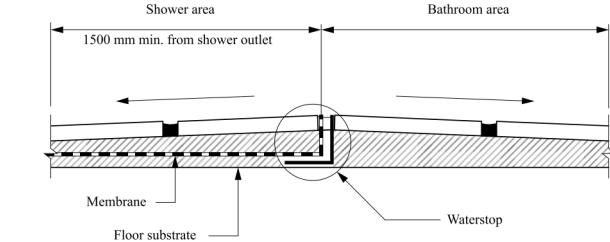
TYPICAL TERMINATION OF MEMBRANE AT EXTENT OF SHOWER AREA
